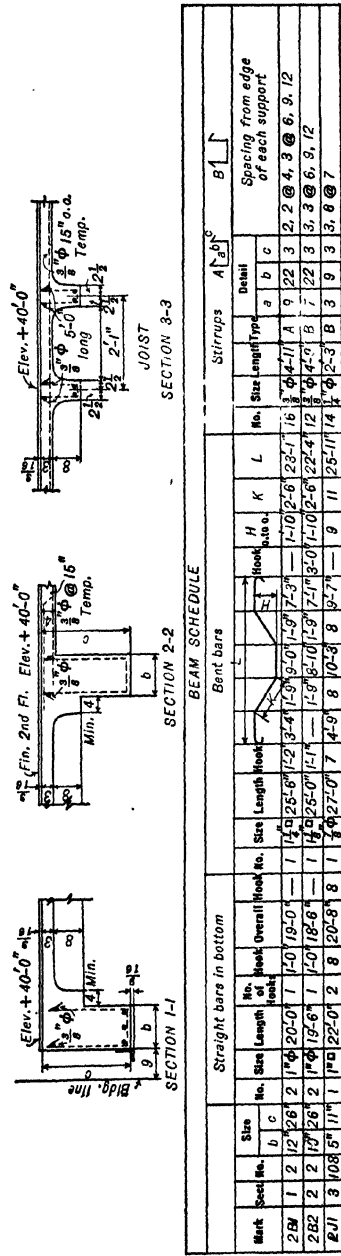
Tabular Form for Beam Details — Reinforced Concrete.
